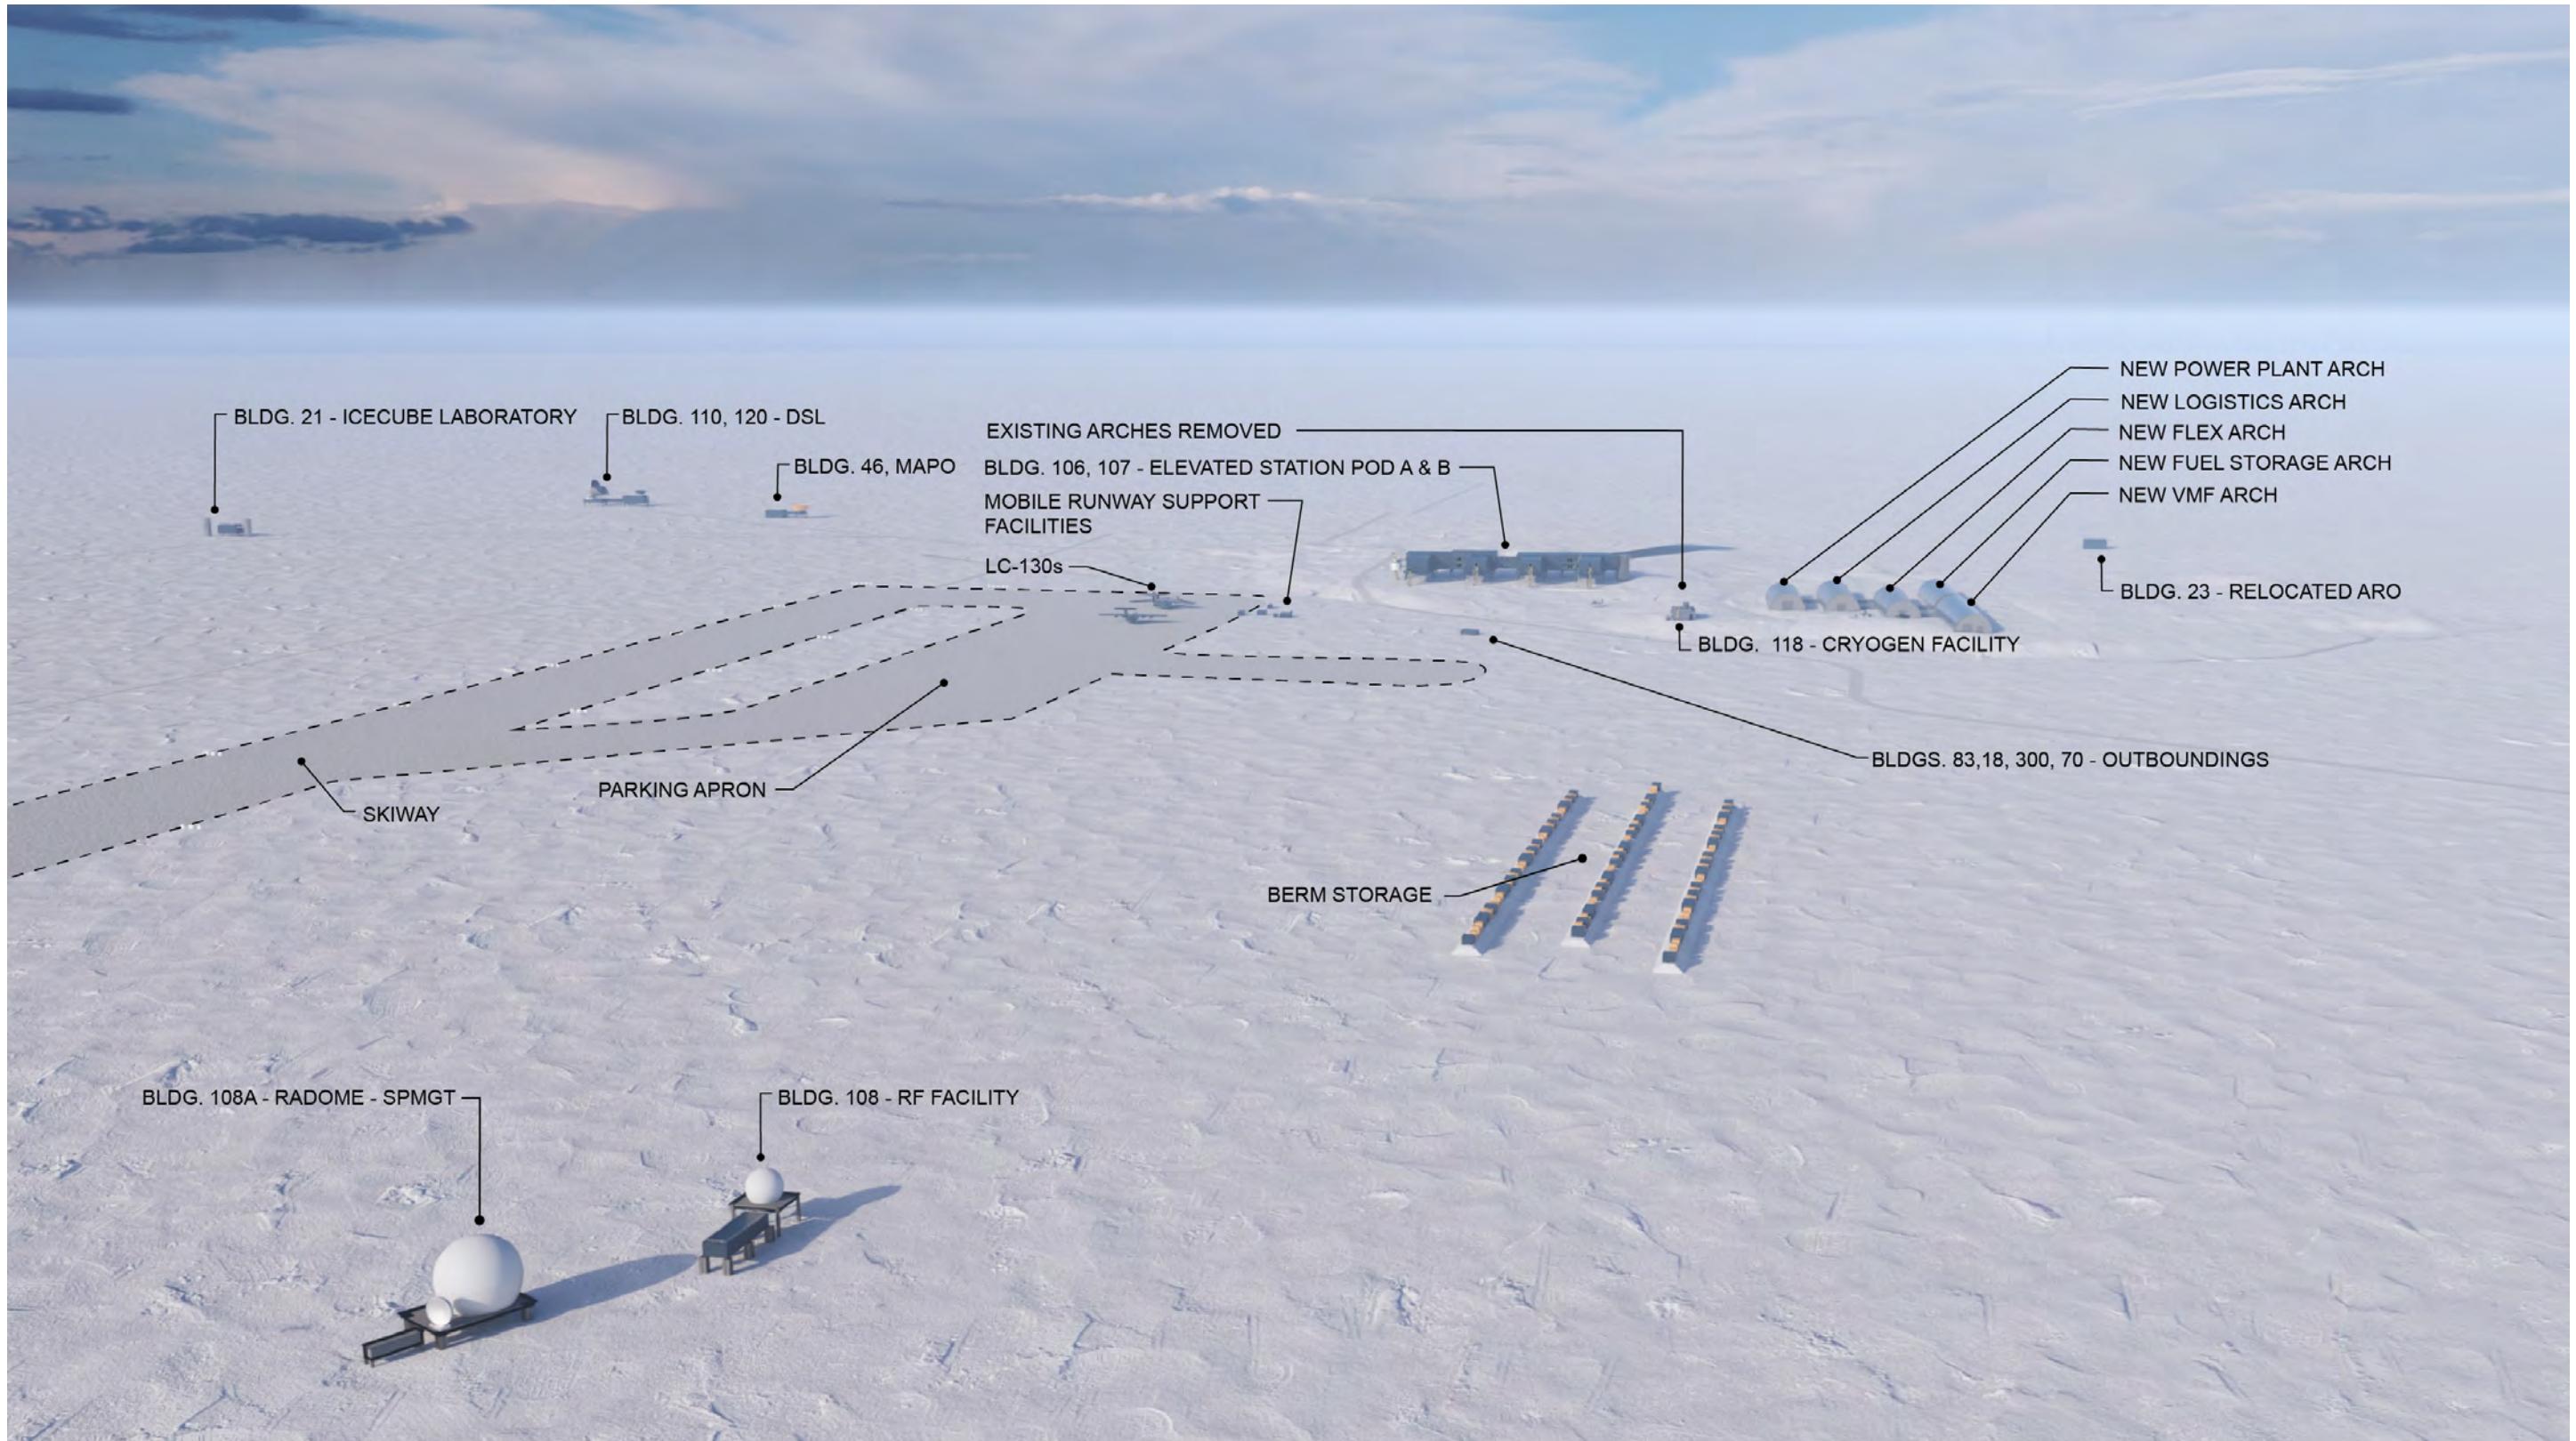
3D rendering of master plan concept: Aerial view looking grid north.
